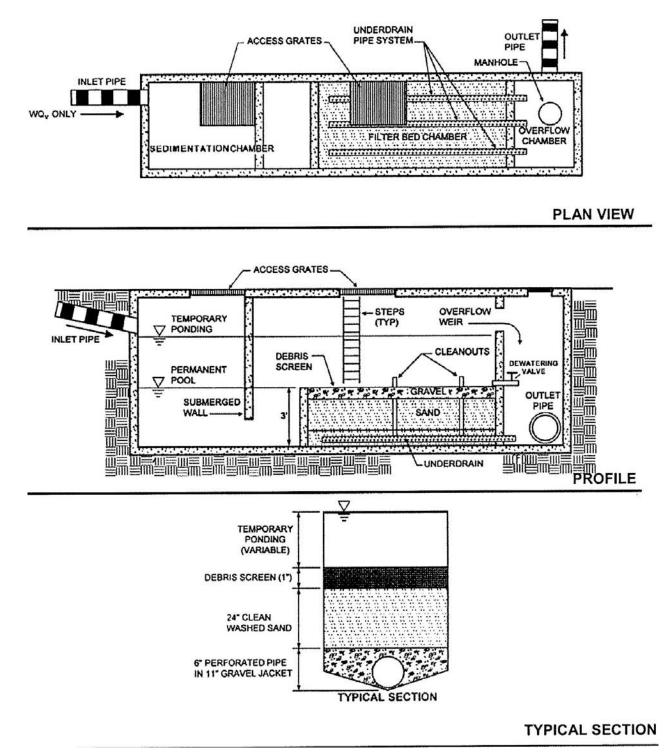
Schematic of an Underground Sand Filter (MDE, 2000)
